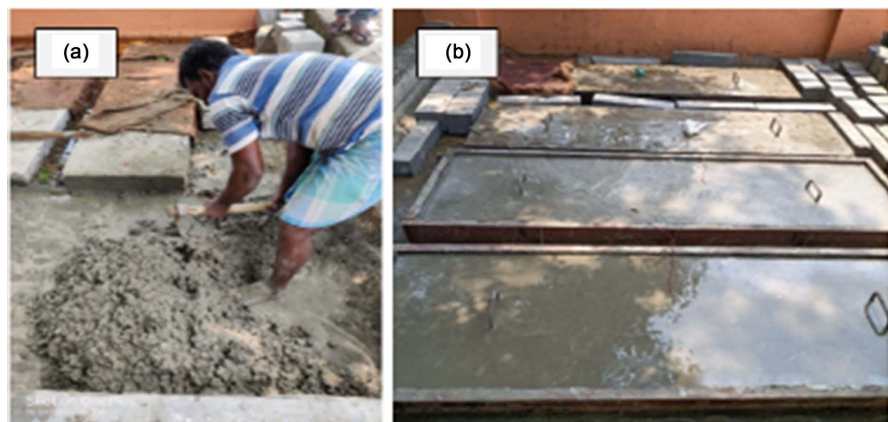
Casting of specimens (a) manual mixing (b) finished surface of specimen.
